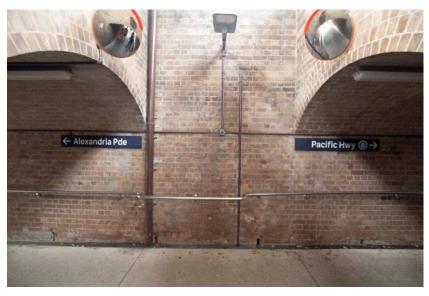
View of the rear brick wall of the subway that forms the wall of the lightwell for the stairs leading up to the platform. Note: the arched ceilings to the subway entrance on either side. (View to southeast)
